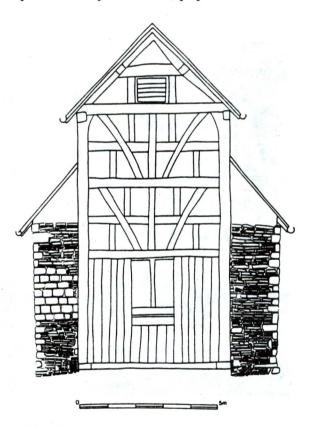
West wall and 16th century tower of Warndon Church (HWCM 338)
